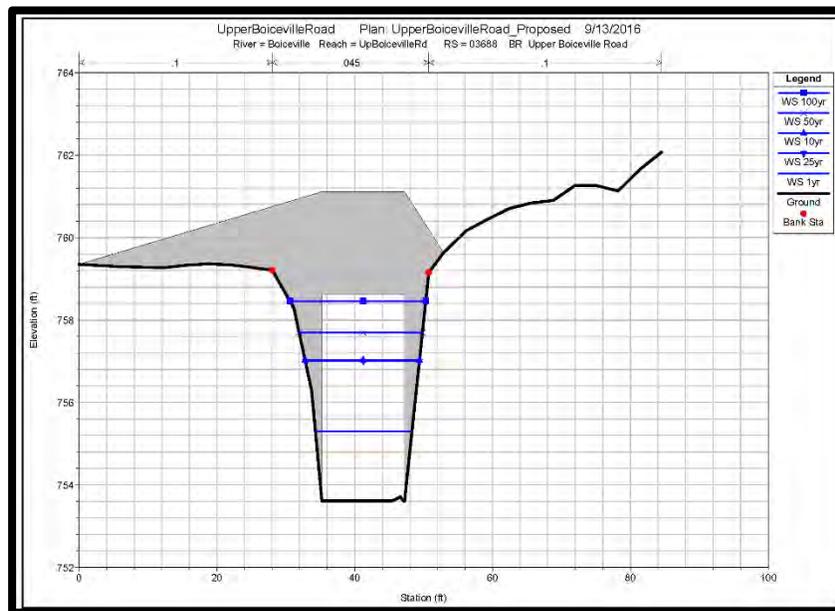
Proposed Cross Section at Upper Boiceville Road Crossing
